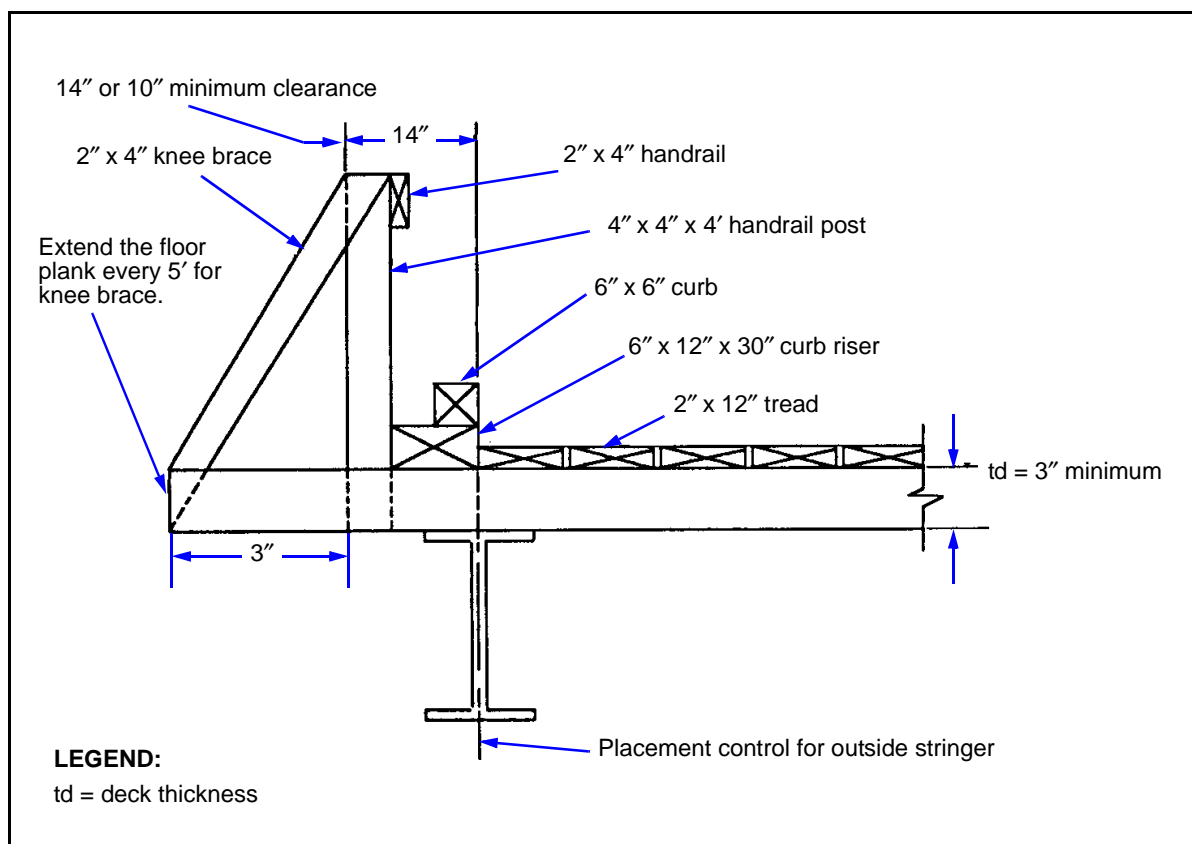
Curb and Handrail Systems for Timber-Deck Bridges
